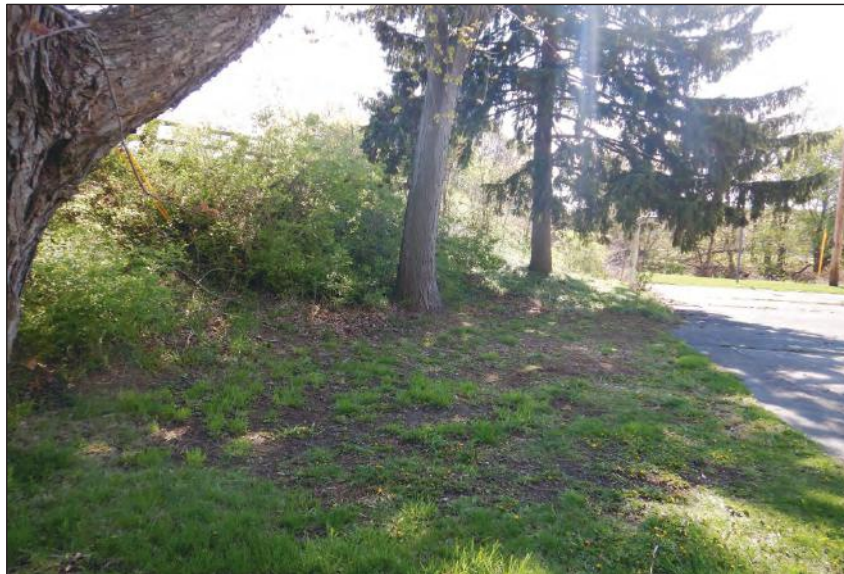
Embankment to the south of the west approach of the Northport Road bridge over S.R. 9, facing southeast.
